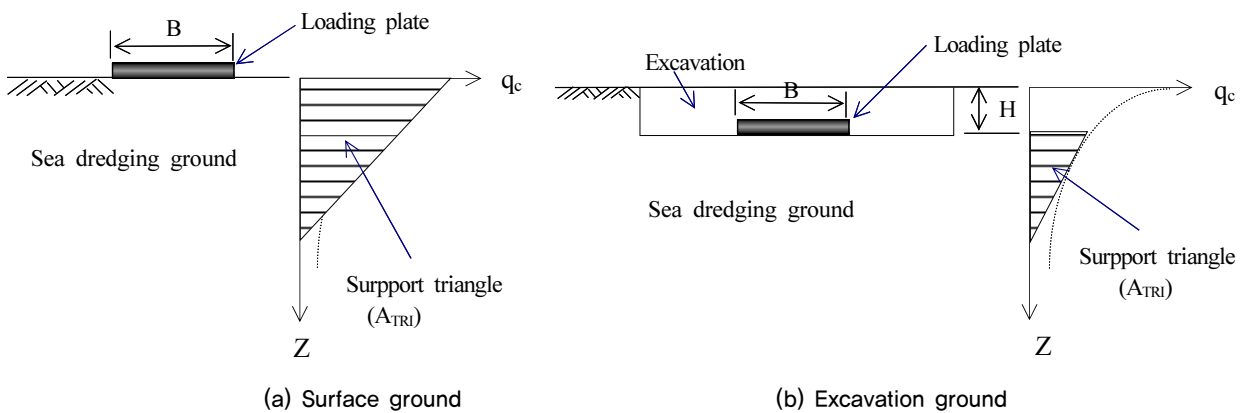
Comparison of plate loading test type in dredged and reclaimed ground
